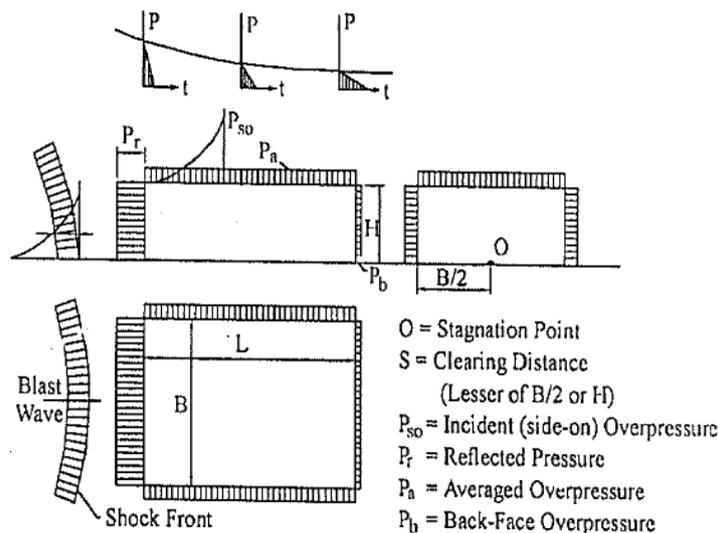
Blast Loading General Arrangement for a Rectangular Building
